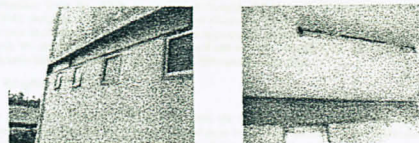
Steel beam should not be exposed to air in the case of concrete beam.
